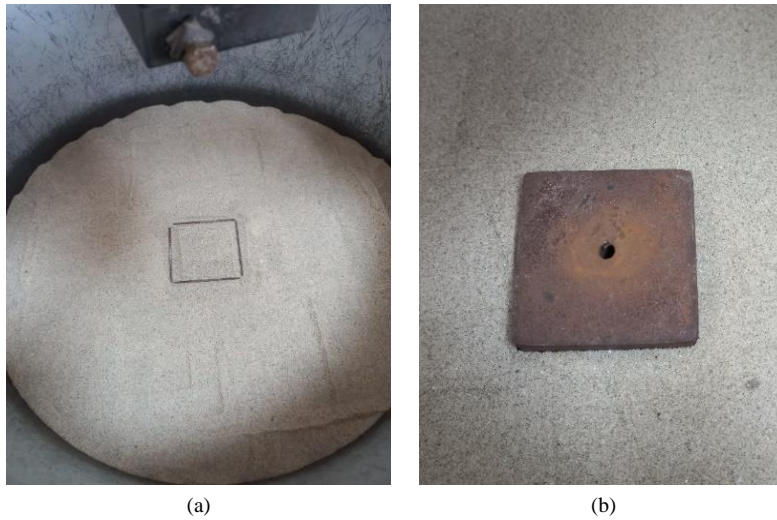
The final surface of sand (a) before installing the footing model, (b) after installing the footing model
